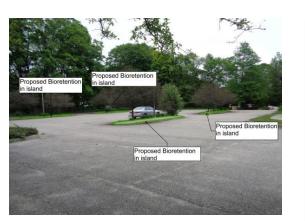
View of proposed bioretention areas located within parking lot islands at the Courthouse Center for the Arts.
